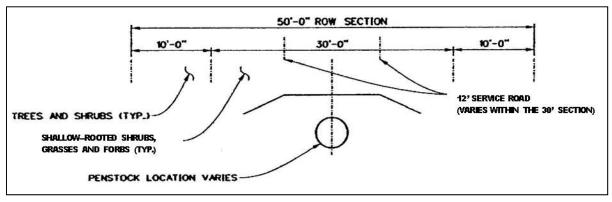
Typical cross section of penstock ROW with service road, per FERC-approved construction drawing YCH-1116.
